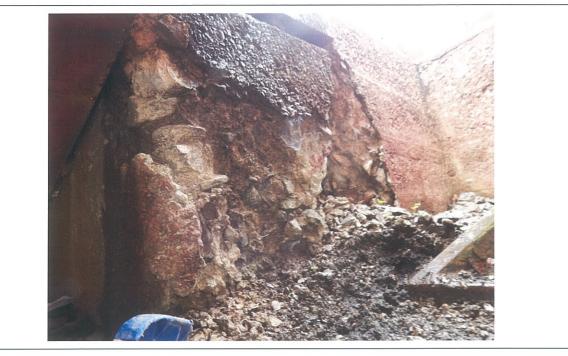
Large spall and delaminated concrete at the north face of the west abutment backwall adjacent to the Girder G4, looking southwest.
